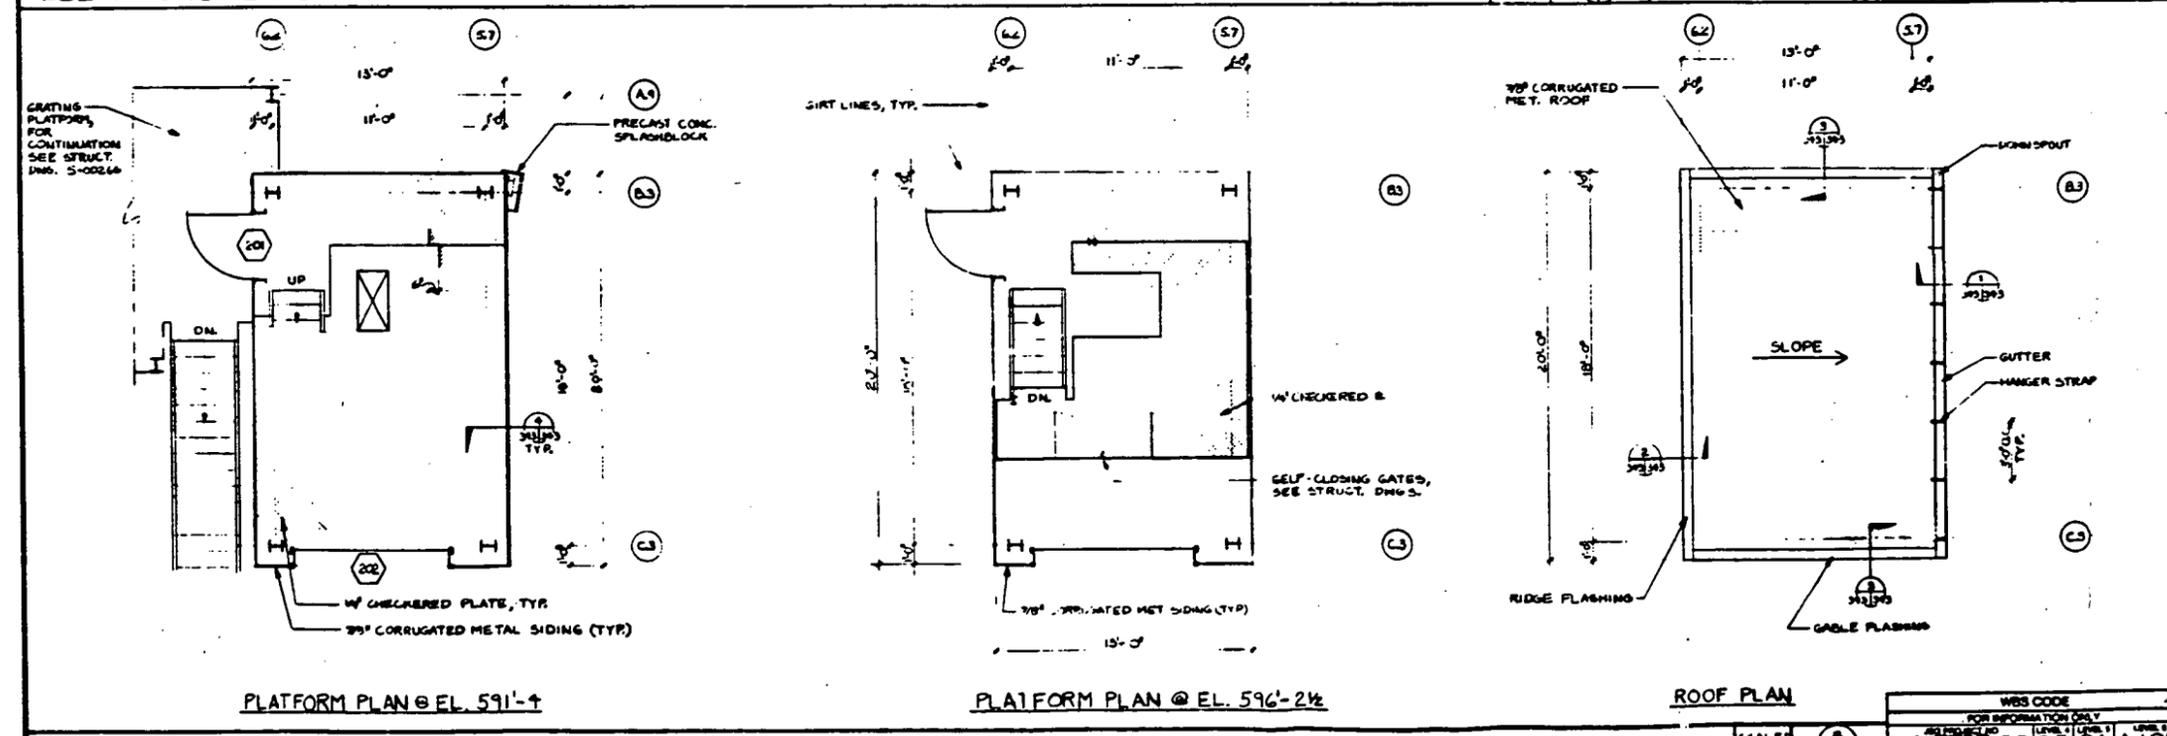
Floor Plan and Elevation, Component 19C, Control House
